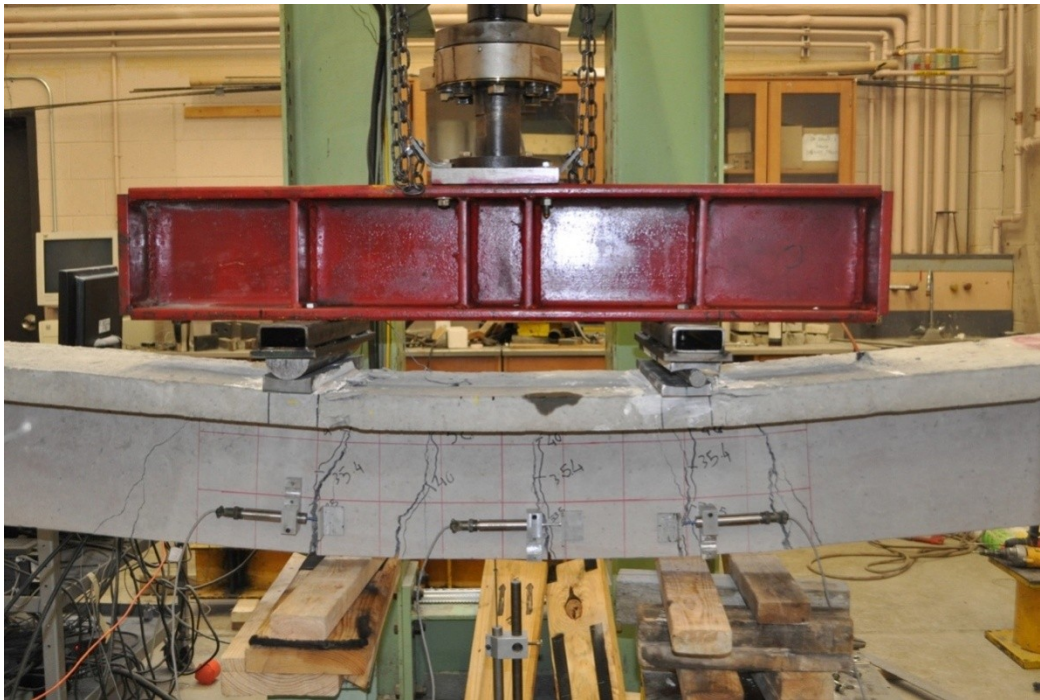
Cracking pattern at failure for an uncorroded beam
